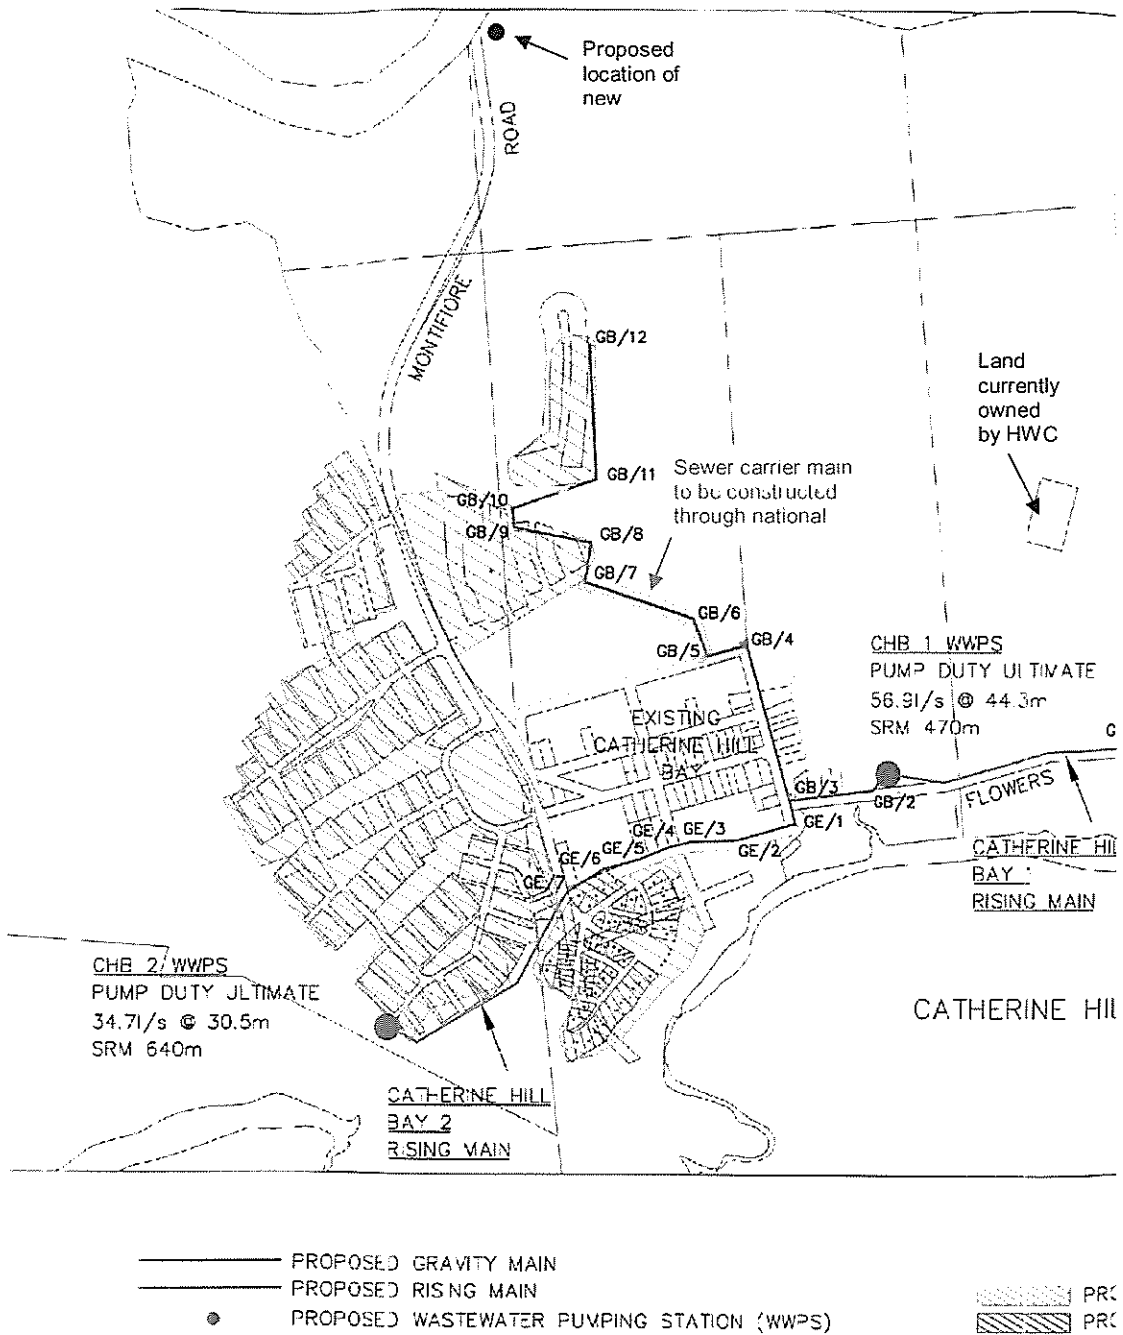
Plan Showing Location of Proposed Sewerage Infrastructure Servicing Catherine Hill Bay. (Extract from Sewer Servicing Strategy.) Proposed location of water supply reservoir is also shown.
